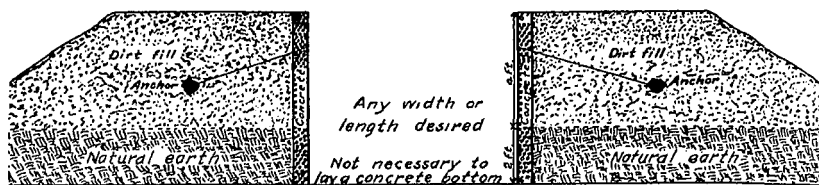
(From U. S. Dept. Agr. Farmers Bull. 1095.) A Trench Silo with Concrete Retaining Walls
